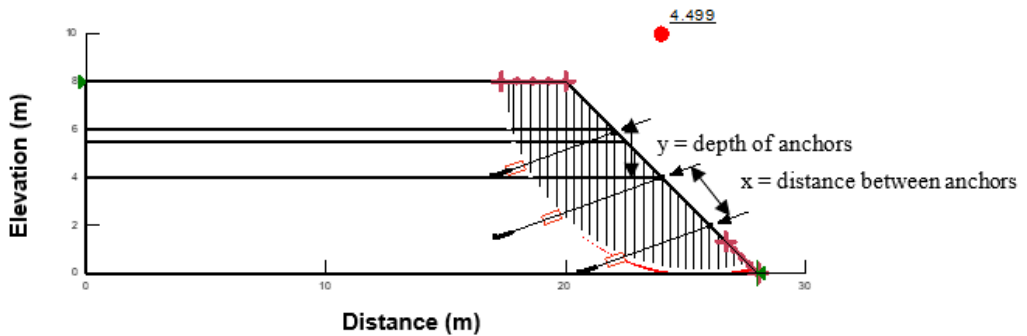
Arrangement of anchors when reinforcing the castle slope.
